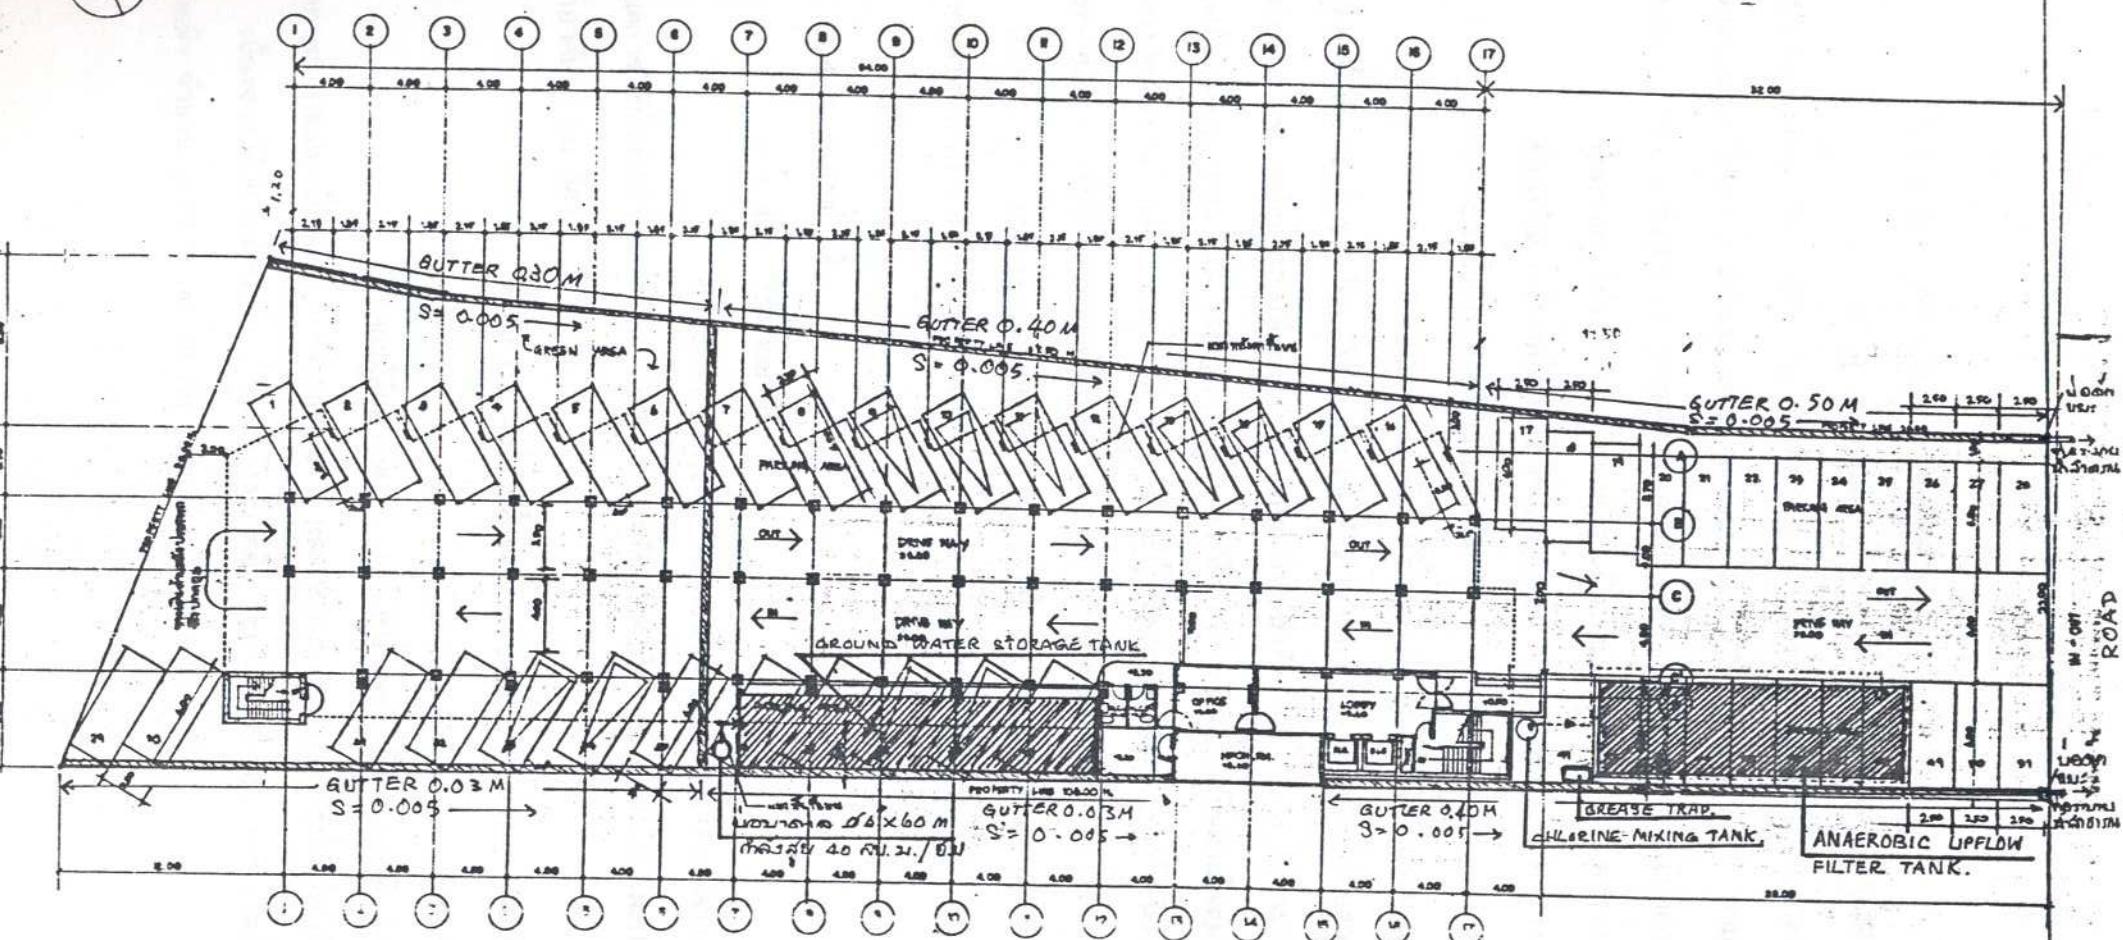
SITE LAYOUT OF DRAINAGE & SANITARY SYSTEM
